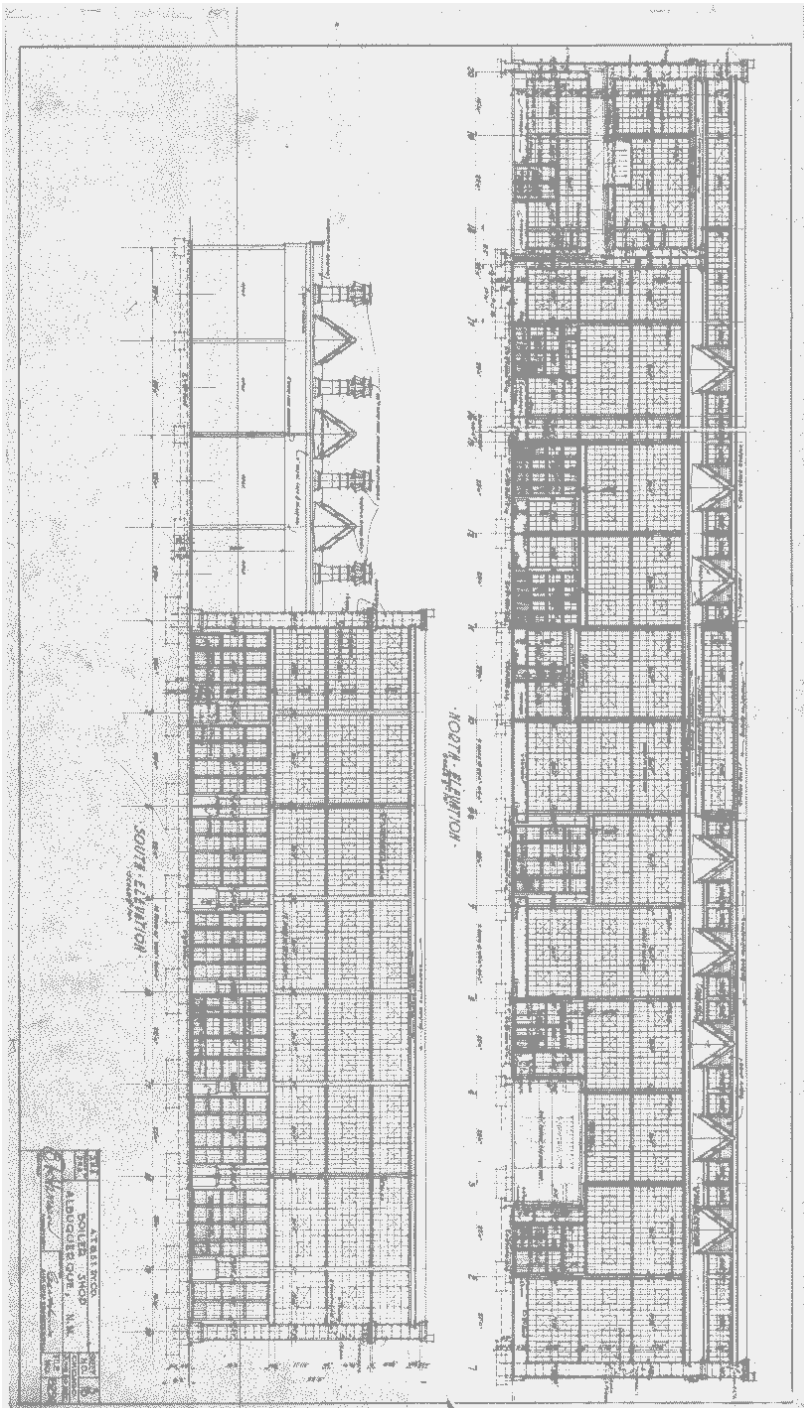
North and South elevations of boiler shop; note original configuration of firing shed. AT&SF Engineers, drawing c.1922
